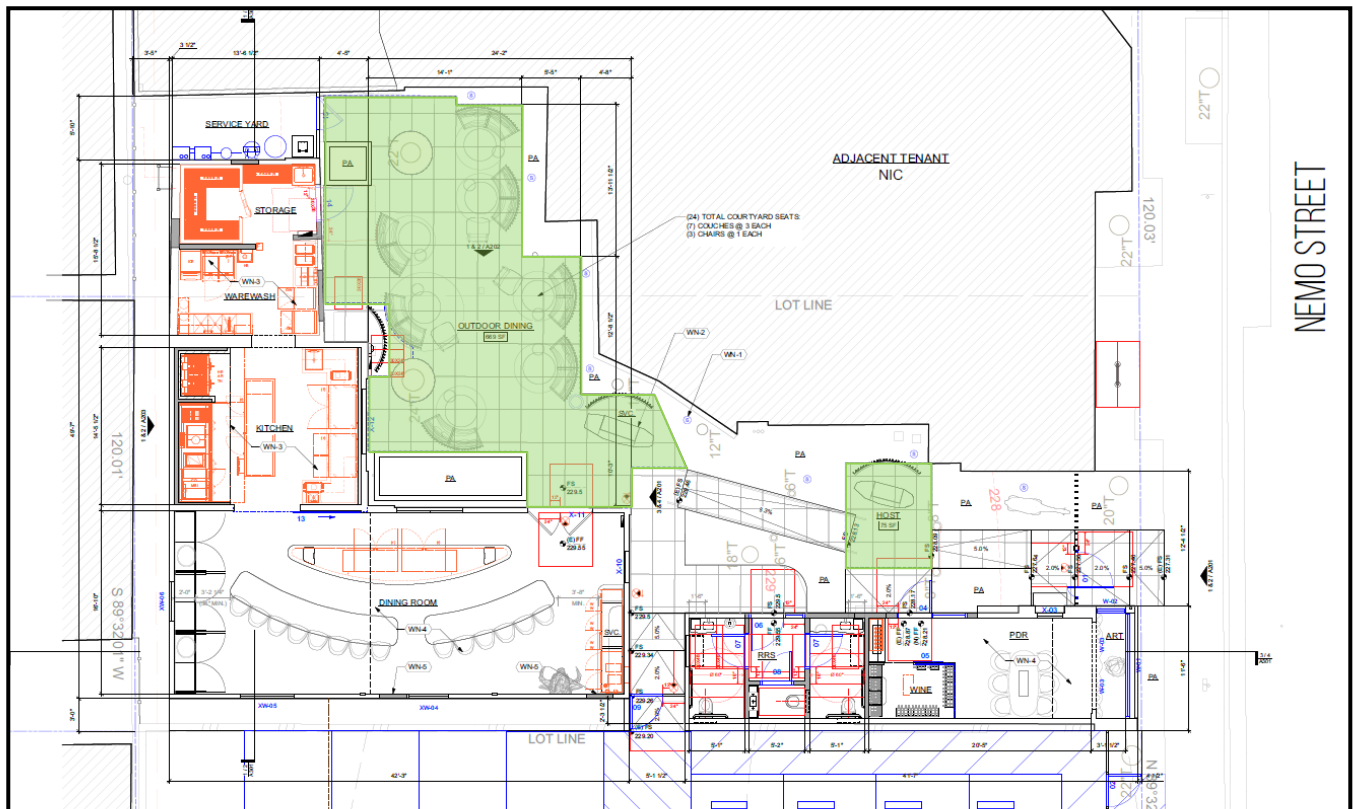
Floor Plan of the tenant space (outdoor area highlighted in green).
